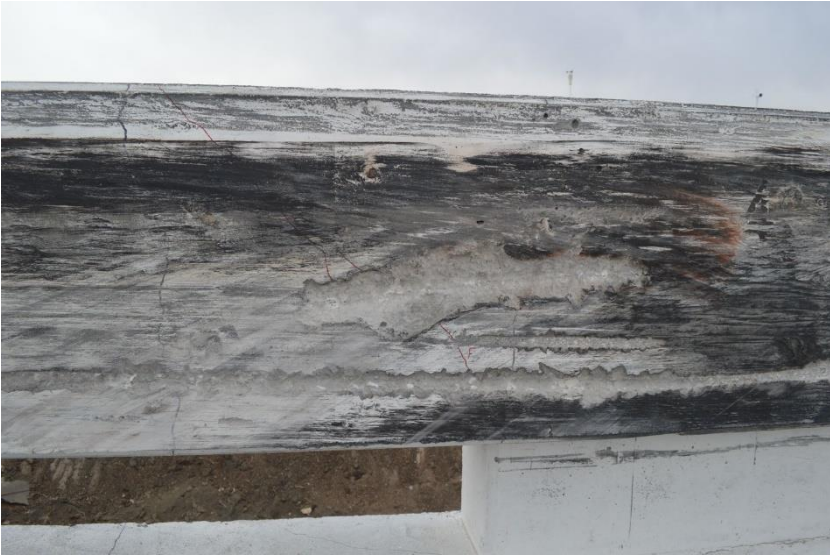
Concrete Beam Damage from Post Nos. 4 through 6, Test No. OCBR-3
